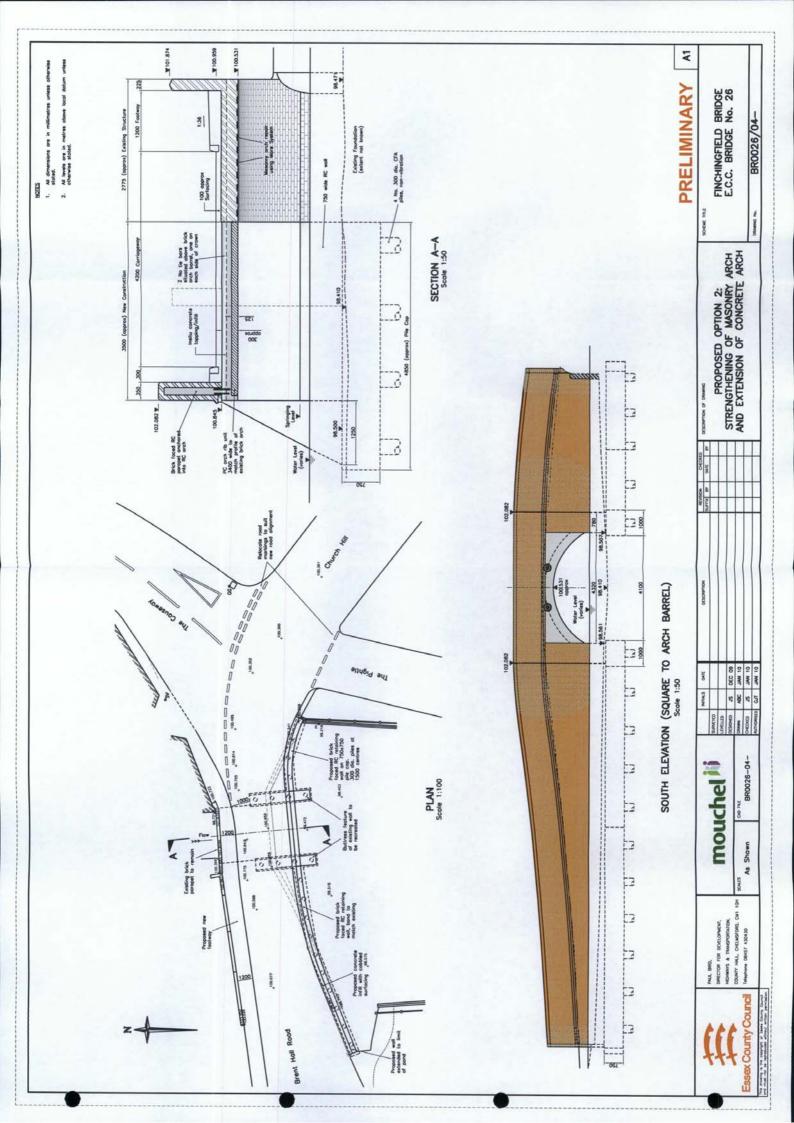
/04—Reconstruction Option 2 Masonry Arch Strengthening and Replacement of Mass Concrete Arch
